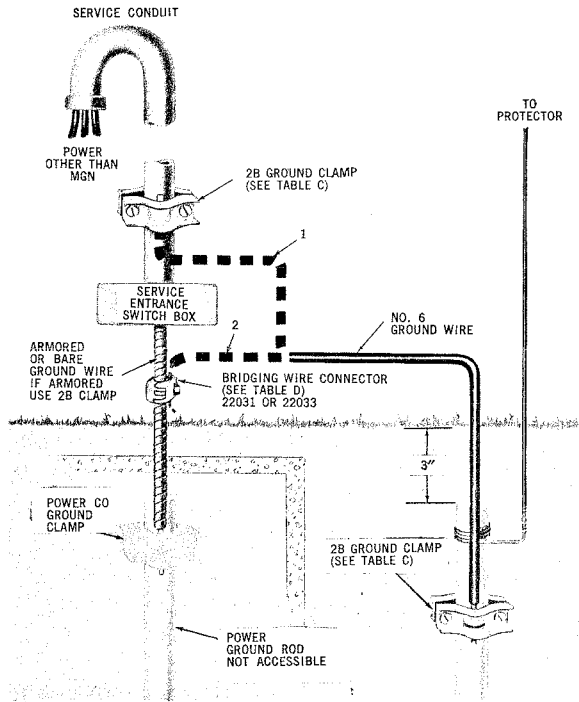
Power Other Than MGN Grounded to Inaccessible Ground Rod—No Water Pipe
